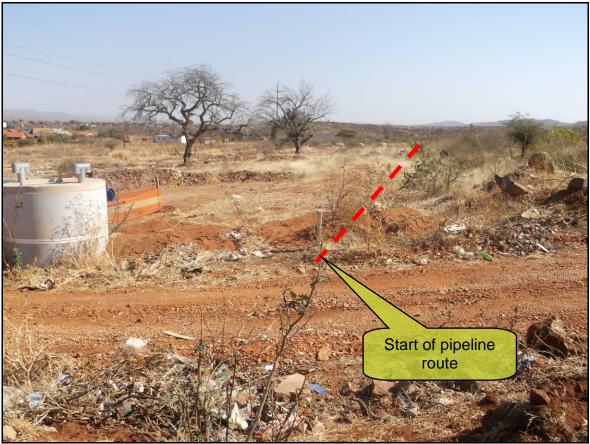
View of start of pipeline route at the connection point with existing pipelines near the Piet-Se-Kop Reservoir
